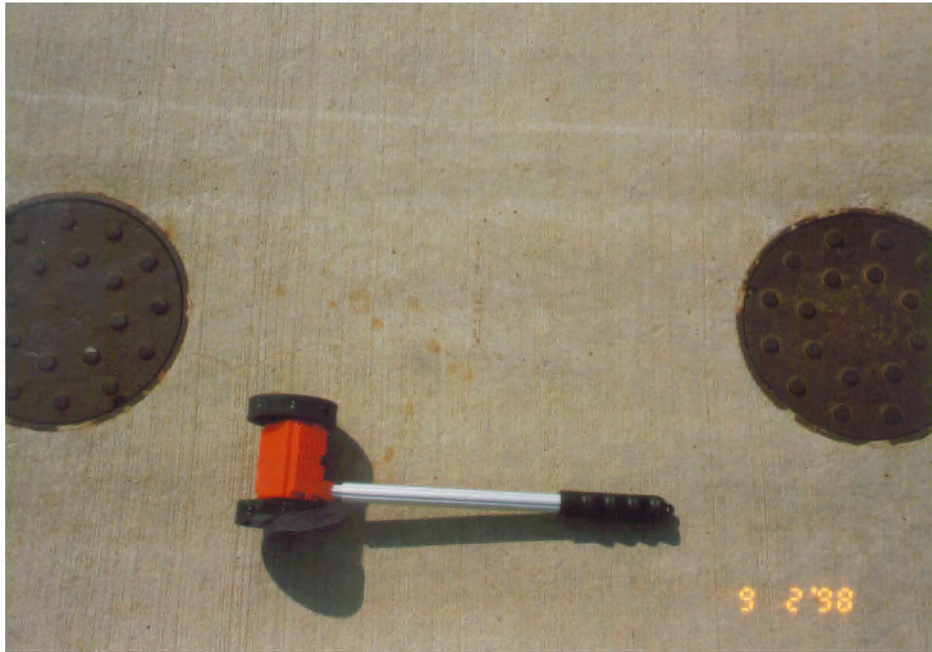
CRACK BETWEEN INSPECTION HANDHOLES (SEPT. 1998)
